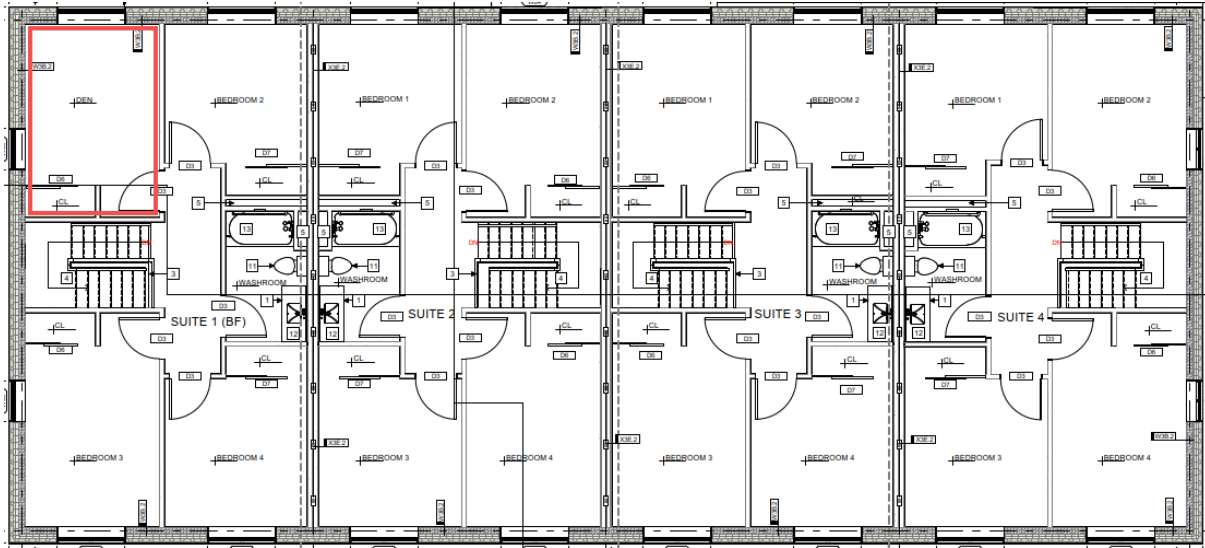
Excerpt of the Second Floor Reference Plan for 58 Capilano Drive. The existing Den is outlined in red (Source: CSV Architects).
